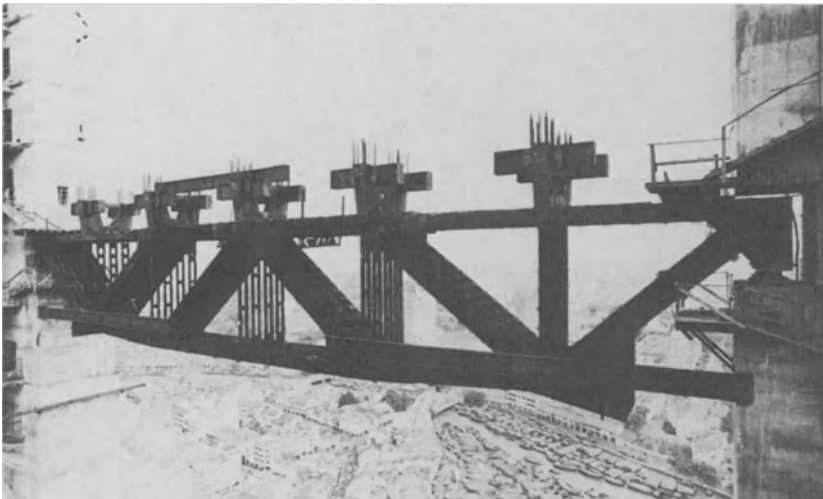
Erection of transfer girders, OCBC Bank, Singapore
